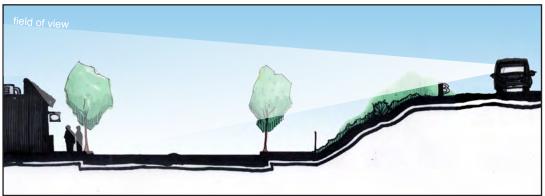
Section-elevation demonstrating heighted level of Highway 101 and the aesthetic significance of roof-articulation
